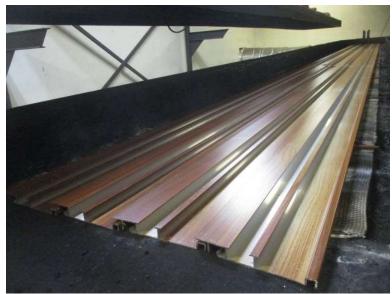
Unexposed Surface of the Test Specimen (Pre-test)
